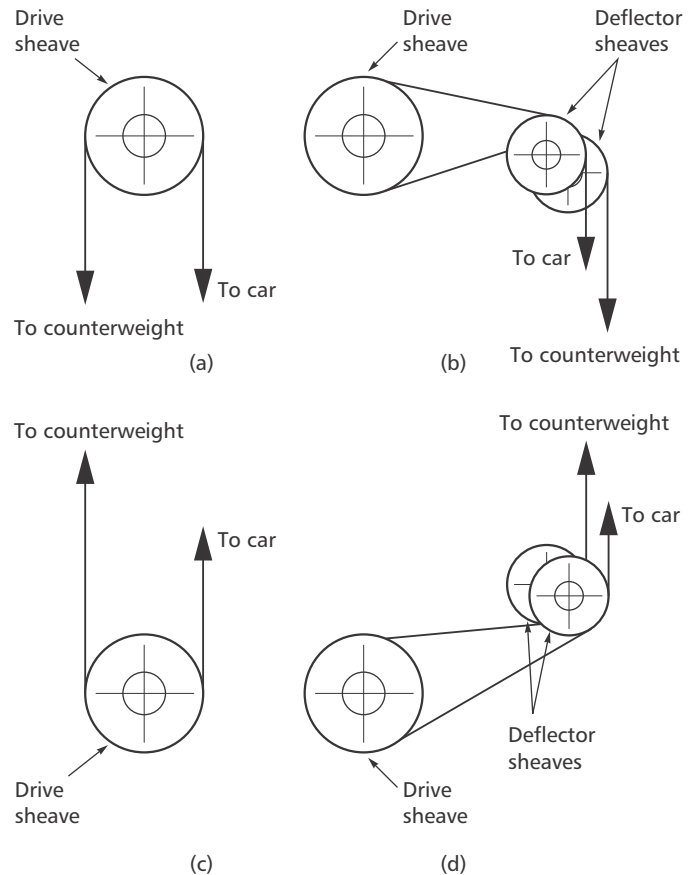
Machine position; (a) top drive, machine above, (b) top drive, machine adjacent, (c) bottom drive, machine below, (d) bottom drive, machine adjacent
